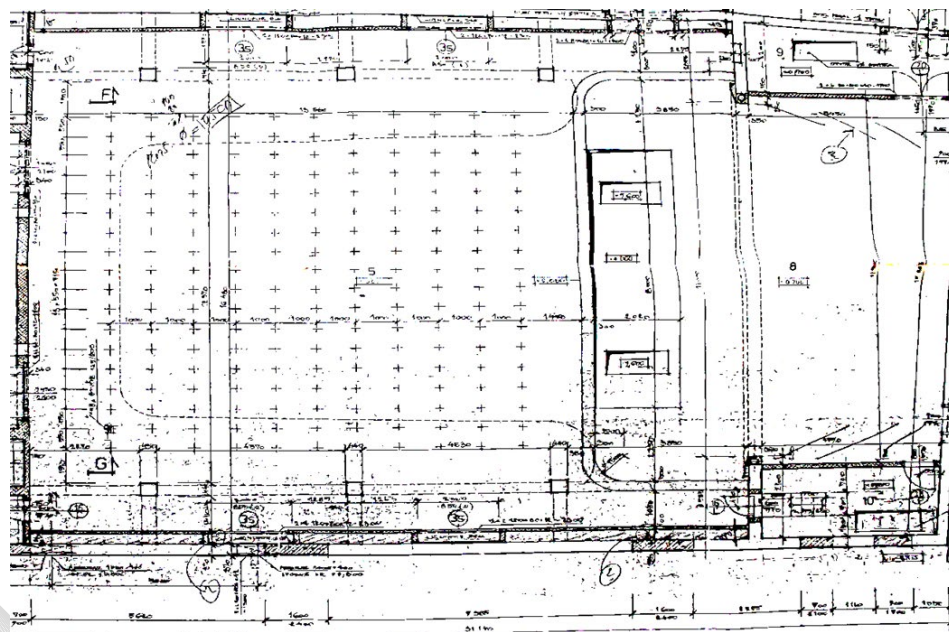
Plan view of concert hall Fatra (Courtesy of State archive Zilina)
